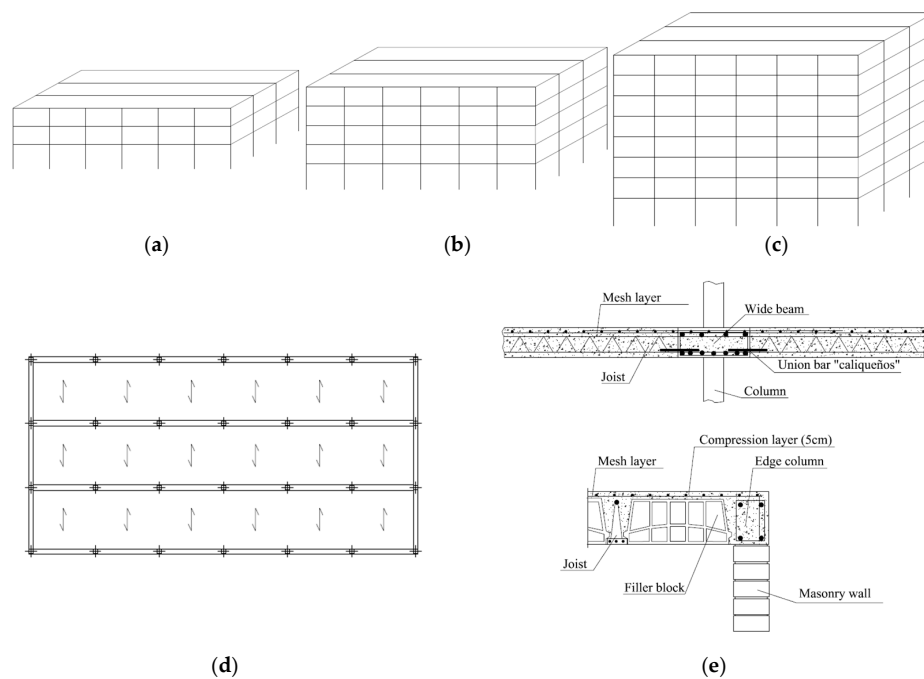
Structural and construction details of buildings with wide beams considered; (a) 3 Storey building; (b) 5 Storey building; (c) 8 Storey building; (d) Plan type of building considered; (e) Waffle slab detail.
